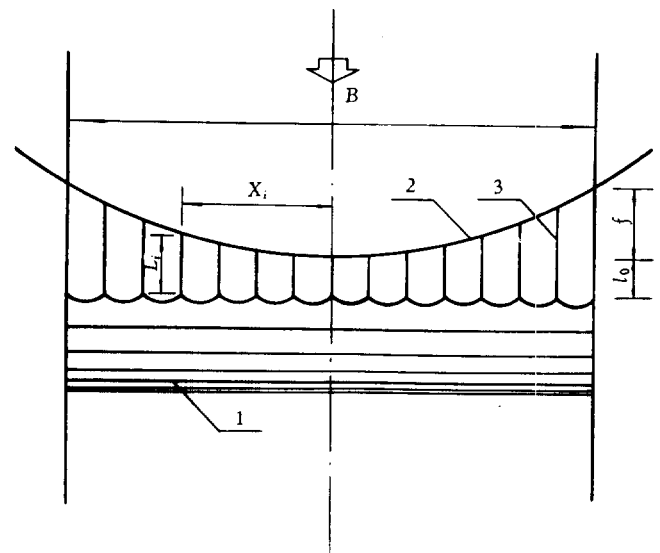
Layout plan of membrane dam: 1-dam, 2-main cable, 3-secondary cables
